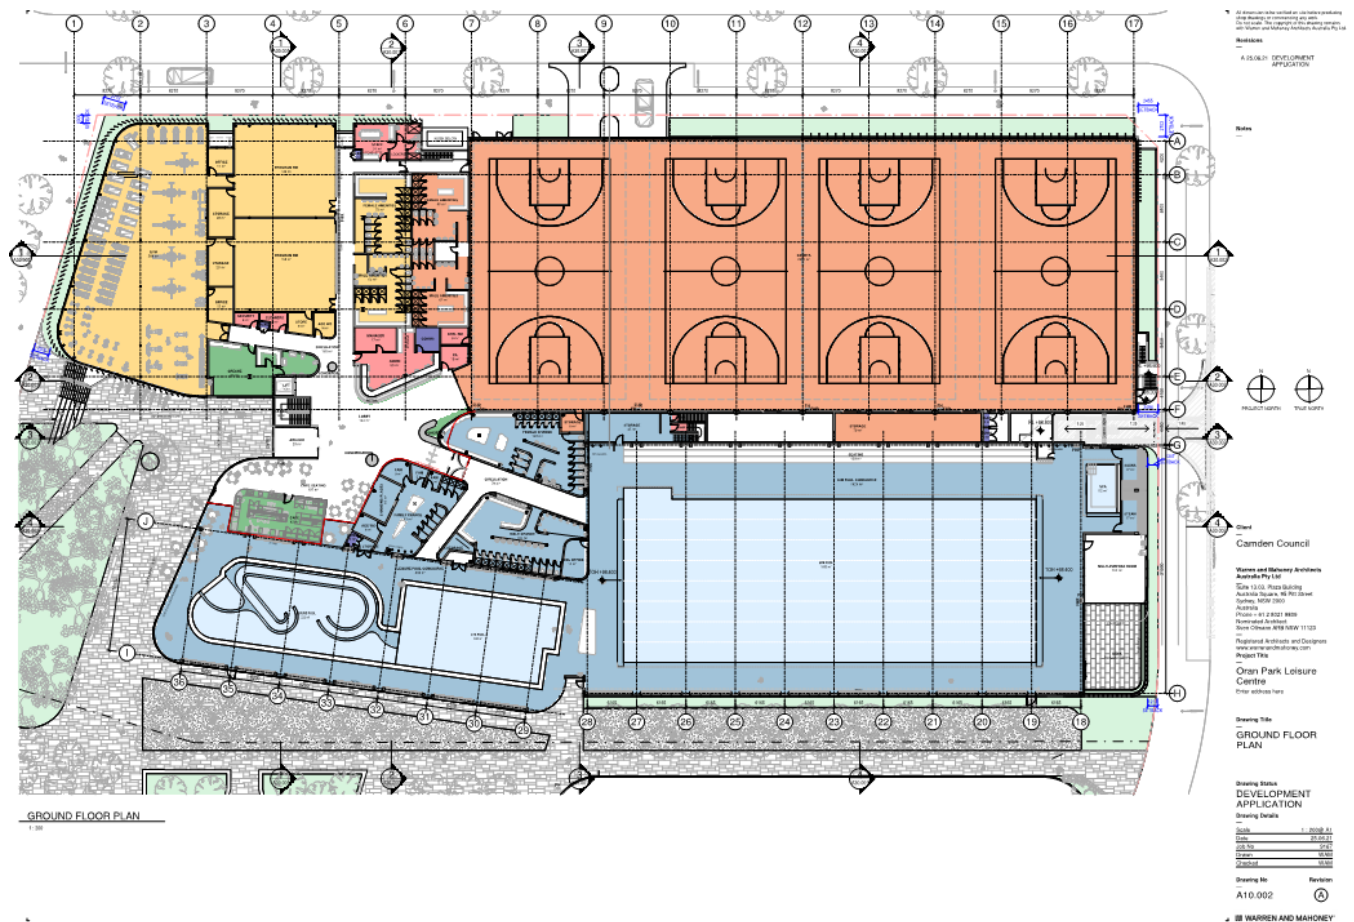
Ground Floor plan (Ref: Dwg A10.002)
